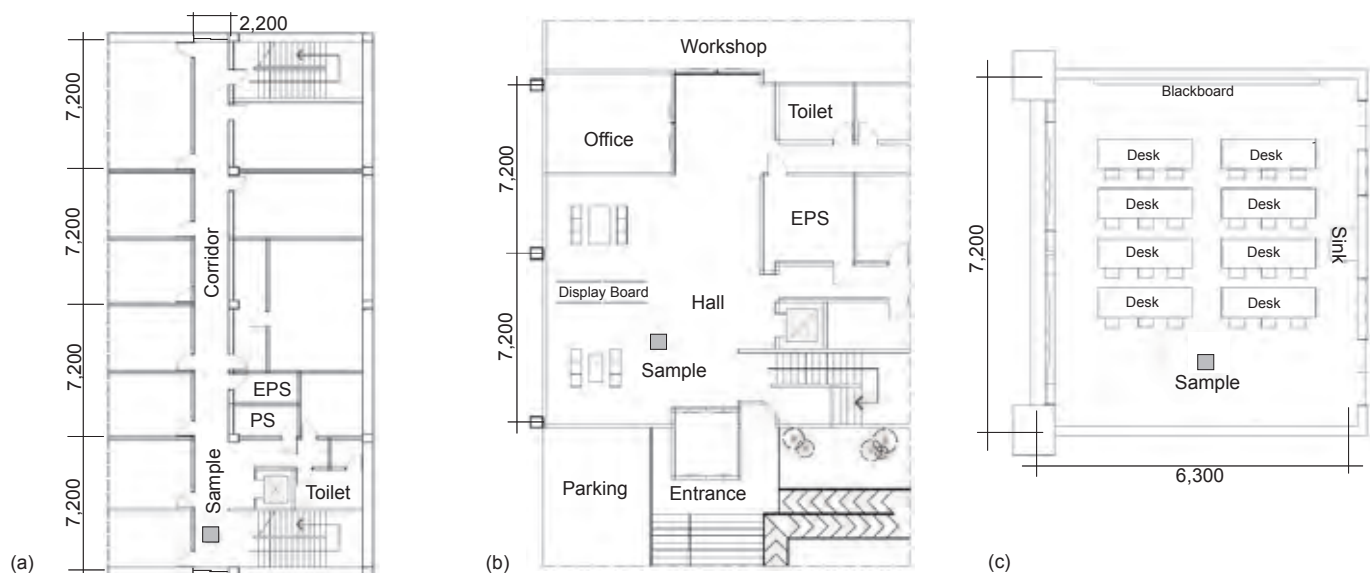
Plan views of furniture layouts and material locations: (a) a corridor; (b) an entrance hall; (c) a seminar room
